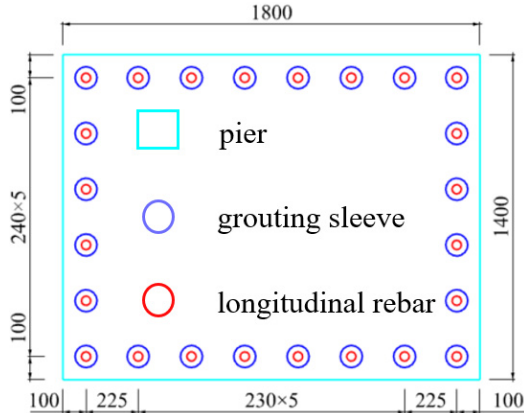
Detailed drawing of grouting sleeve arrangement form (unit: mm)
